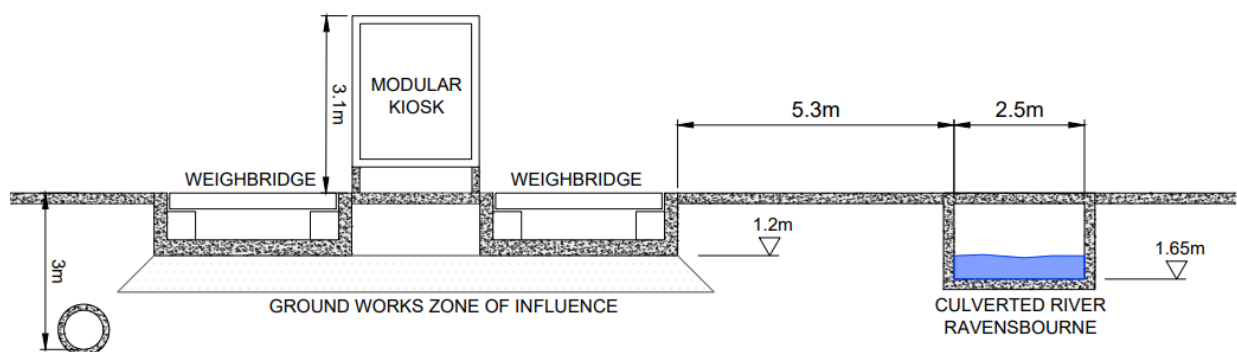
section through kiosk and weighbridges (shows foul sewer on left, and culverted river on right)
